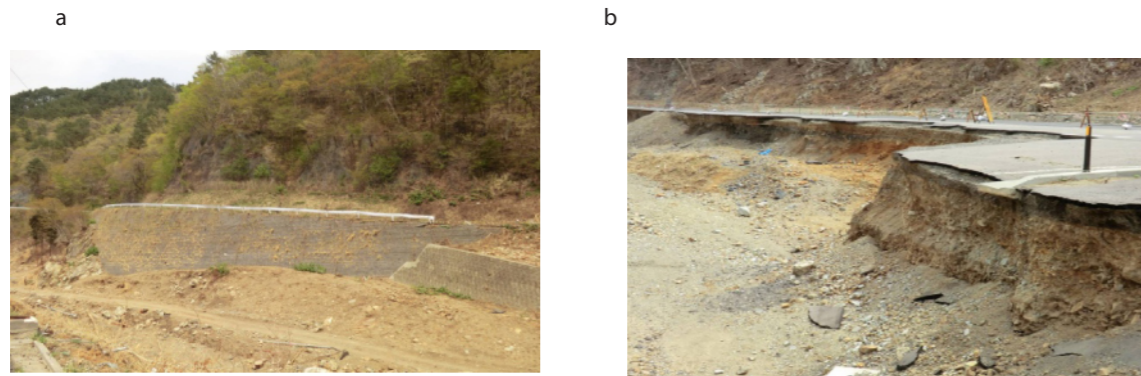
Tsunami caused road embankment erosion in case of a) reinforced soil retaining wall supporting a road and (b) unreinforced soil road embankment in Tanohata village, Iwate prefecture
